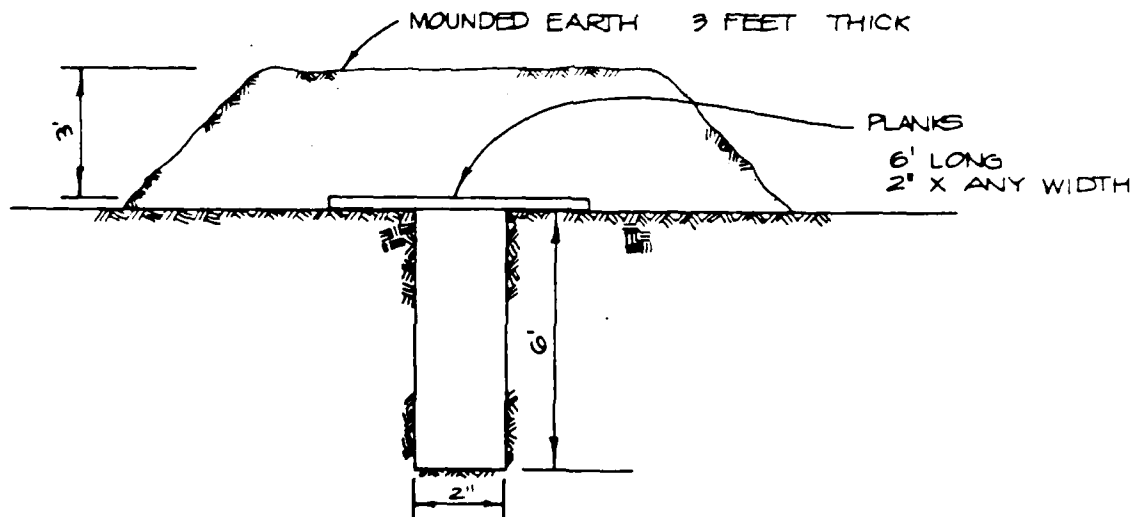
describes a typical trench shelter. Implementation requires only mechanical excavation equipment, sufficient planks or other resources for support of the mounded earth, and soil strata that will stand vertical to a depth of 6 feet with no ground water at that excavation depth.
